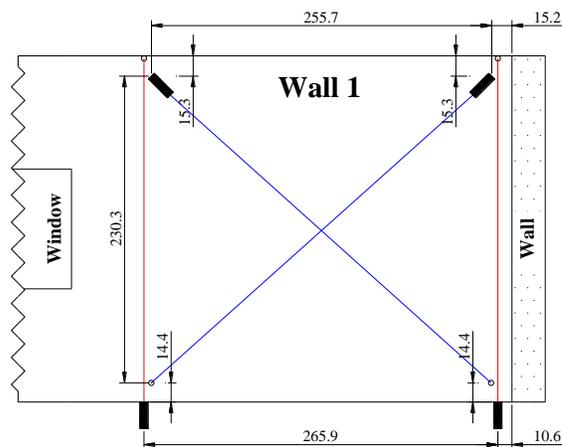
The installed LVDT's for a Representative Wall, Wall 1 (All units are in cm.)
